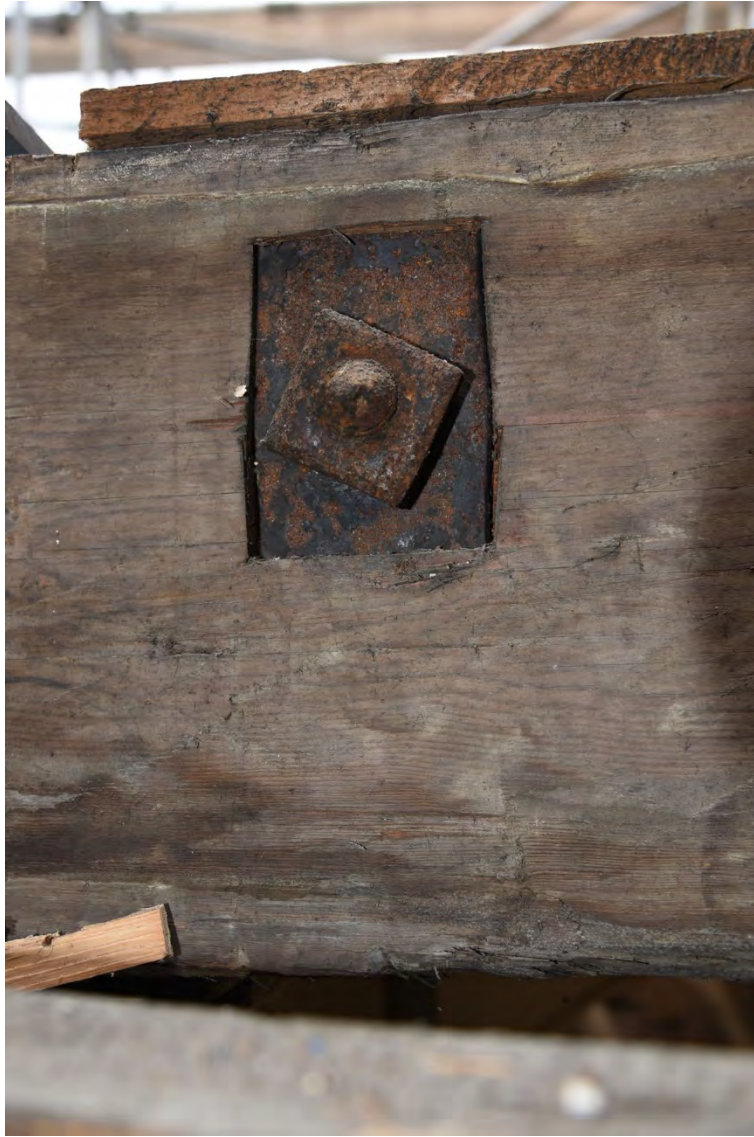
Detail of iron bolt fastening in N tie-beam, looking N (BRH163)
